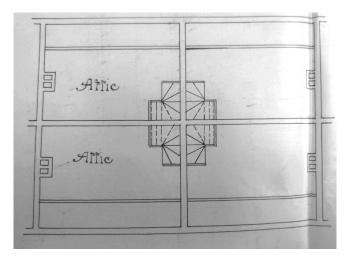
The attic room was open to the staircase (Thackray 1899b).
